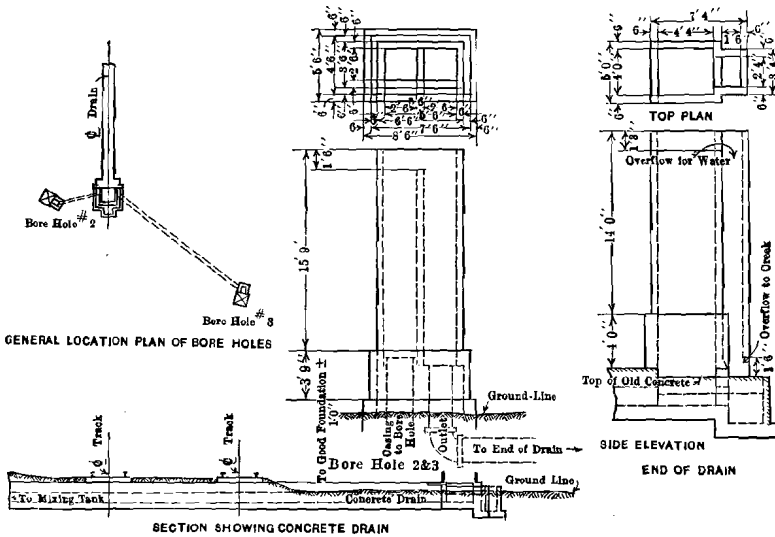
PLAN OF CONCRETE TOWERS AND DRAIN.
